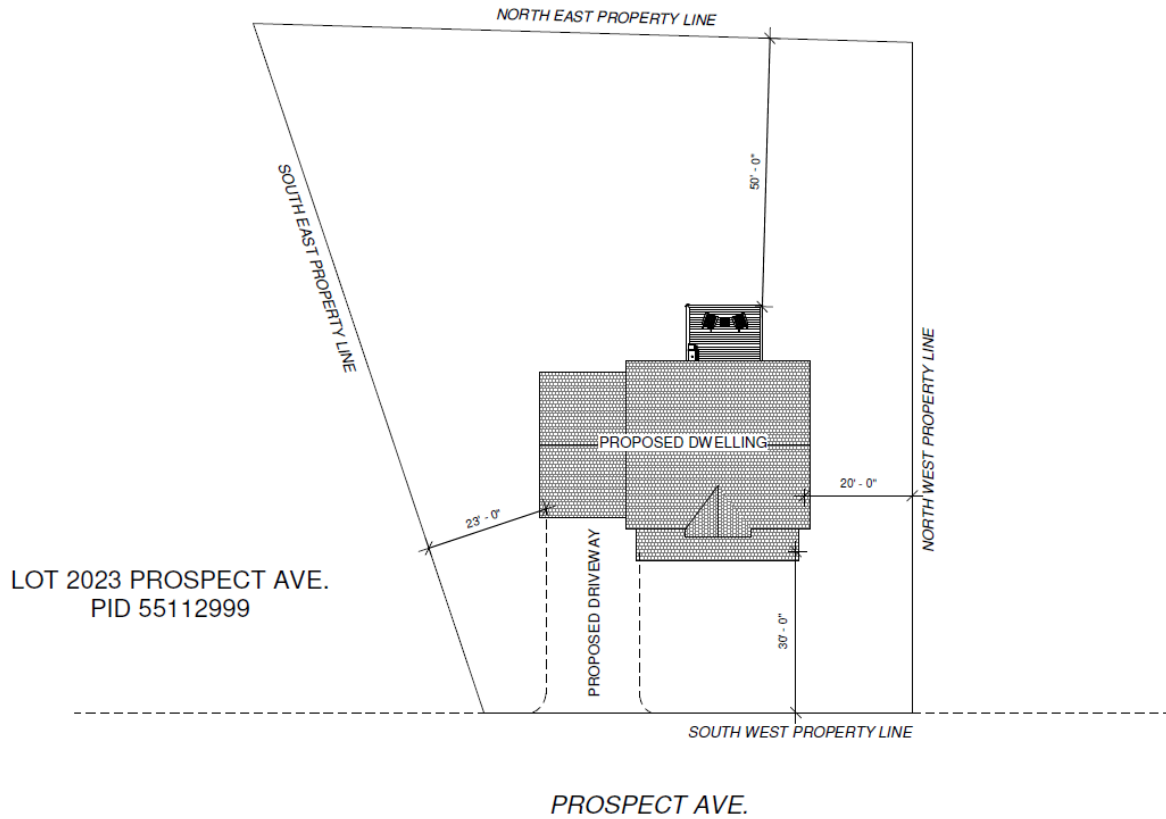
Proposed Lot Configuration for Single-Family Dwelling Development
